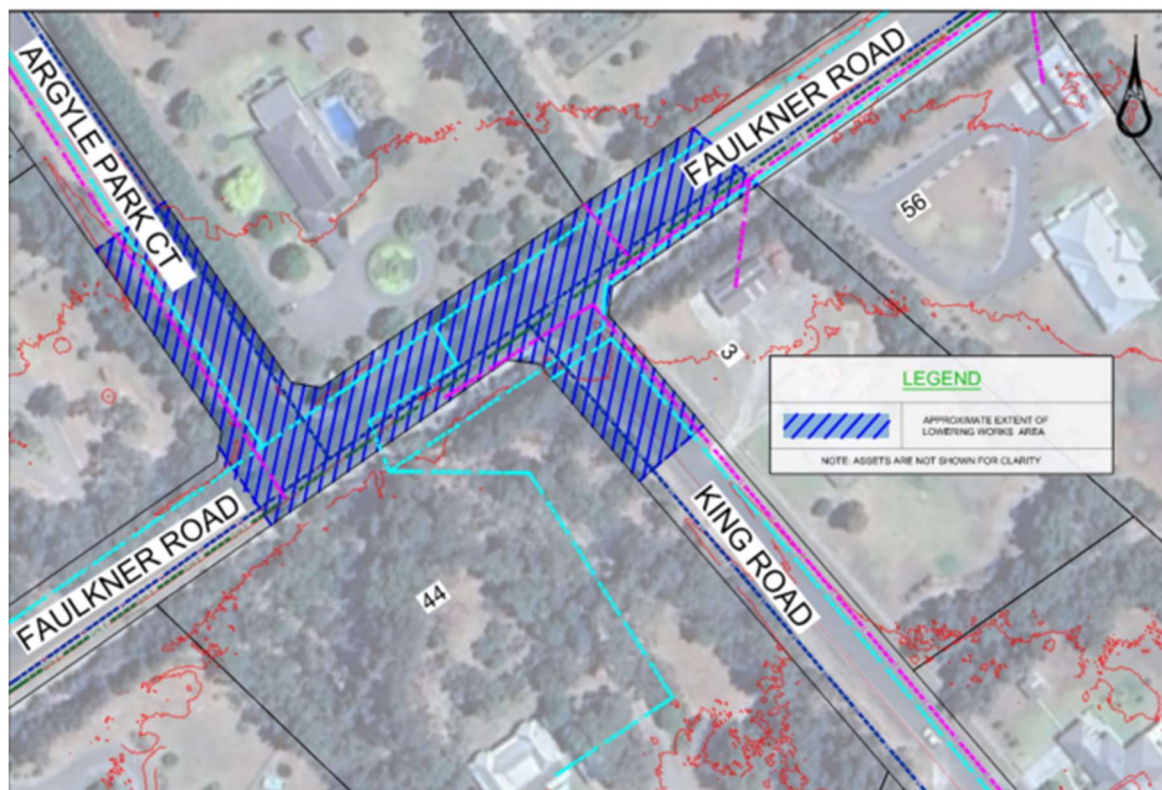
Sketch Plan of Proposed Option 1 Road Lowering extents
